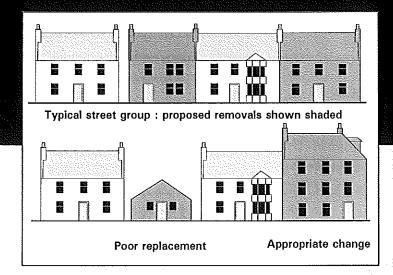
INFILL DEVELOPMENT Replacing buildings in street
